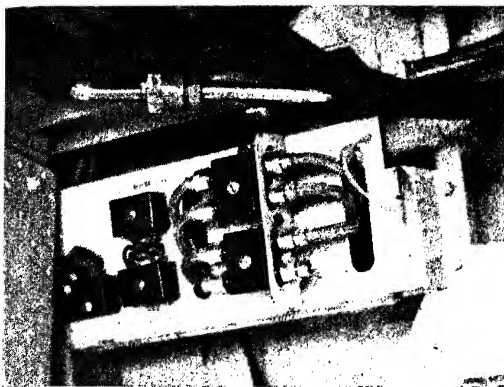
THE CONNECTORS EMPLOYED WHERE A BREAK IN THE CABLE RUN IS FOUND NECESSARY.
